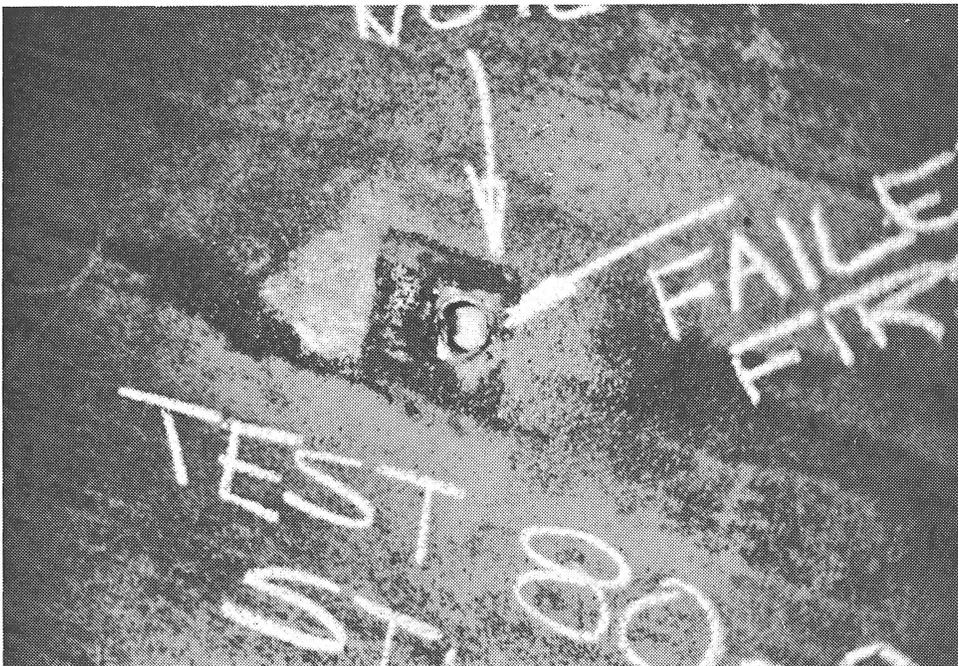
Specimen S-2. Detail of Sheared Stud in Plate
